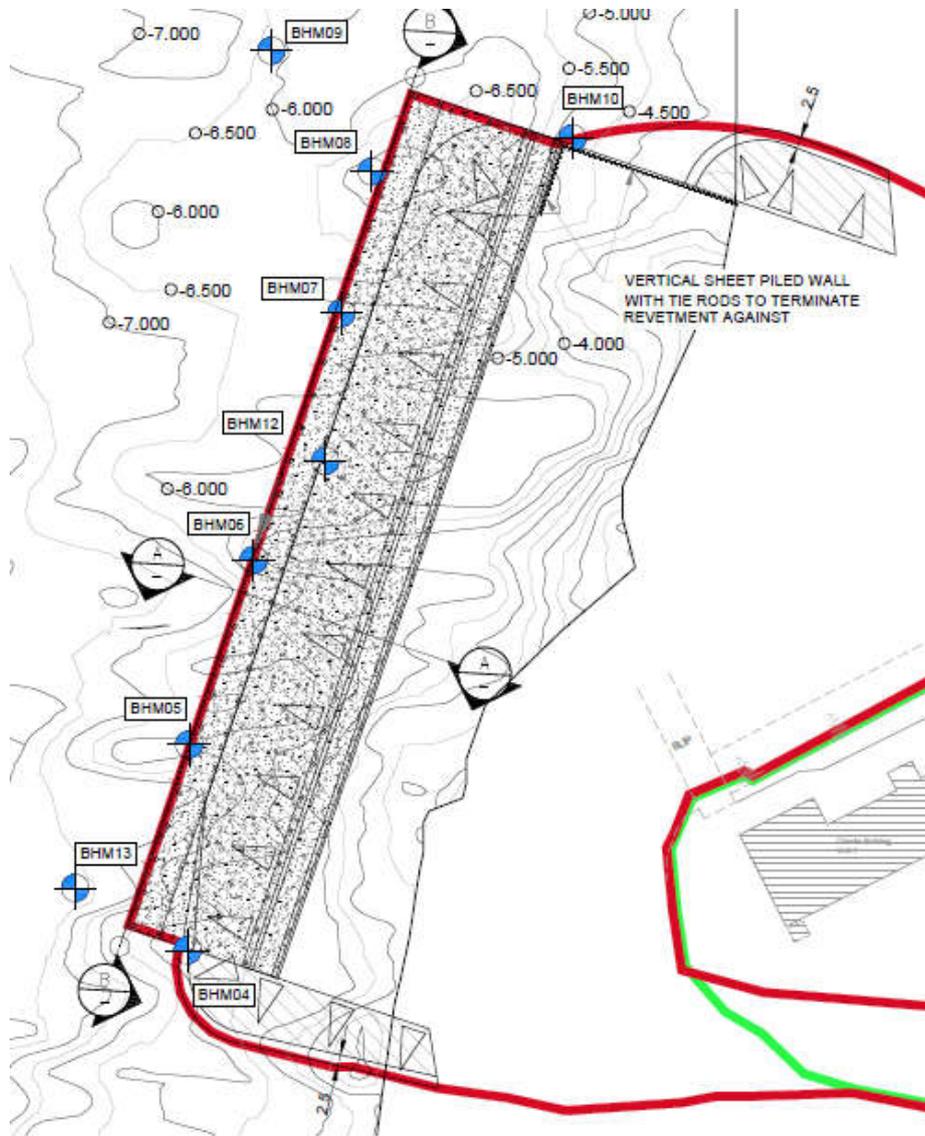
Plan Arrangement of Open Piled Quay Wall
